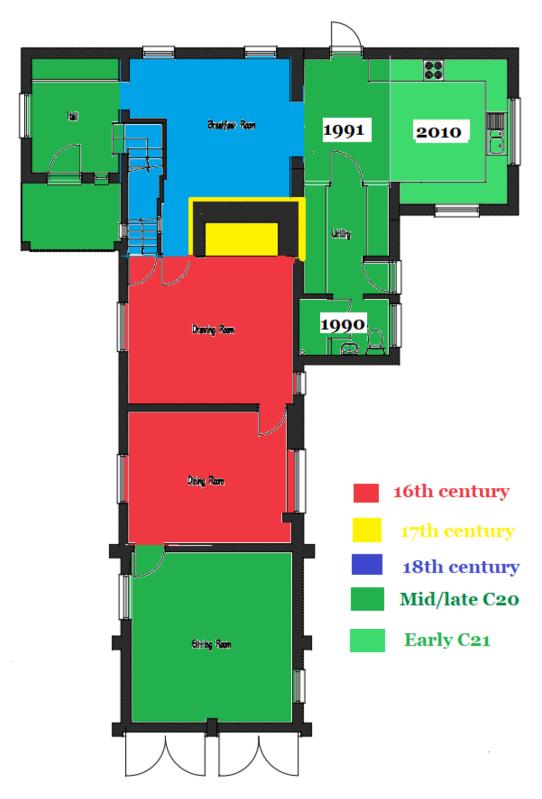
Phasing plan (AHP, from ground floor plan by Aria Design)
